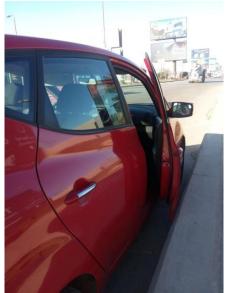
An extremely elevated sidewalk than the street level urges a car driver to stop far away from the sidewalk.
